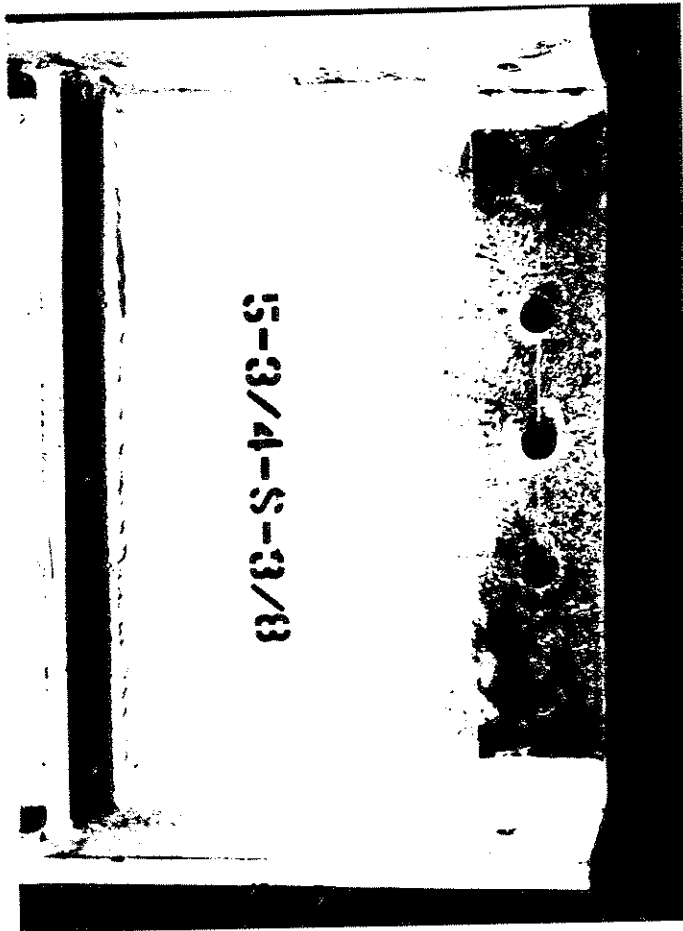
Beam End in Specimen Two After Failure of Bolts
